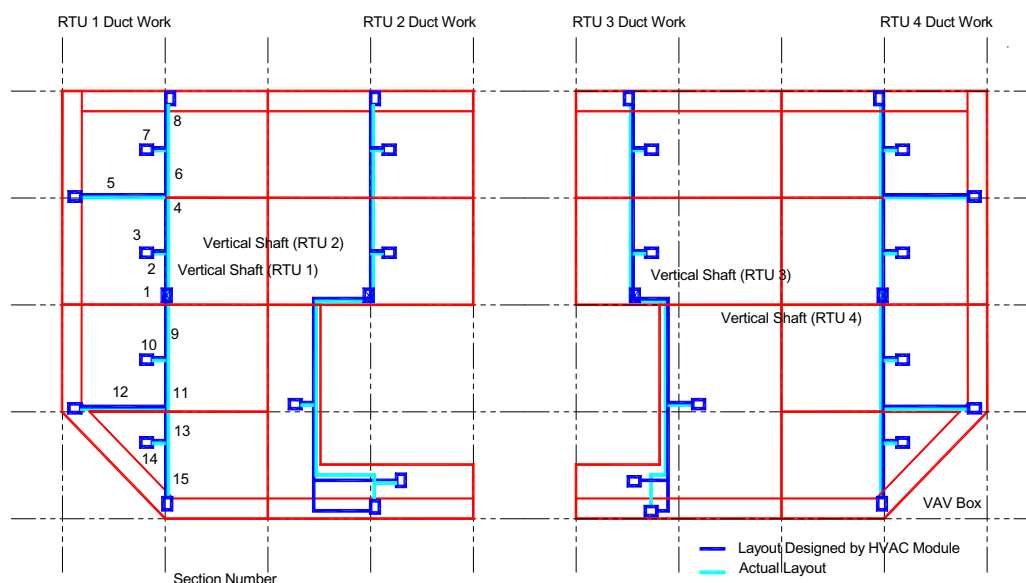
Automatic Duct Layout Generation: Open Plan Office Area, Building A
